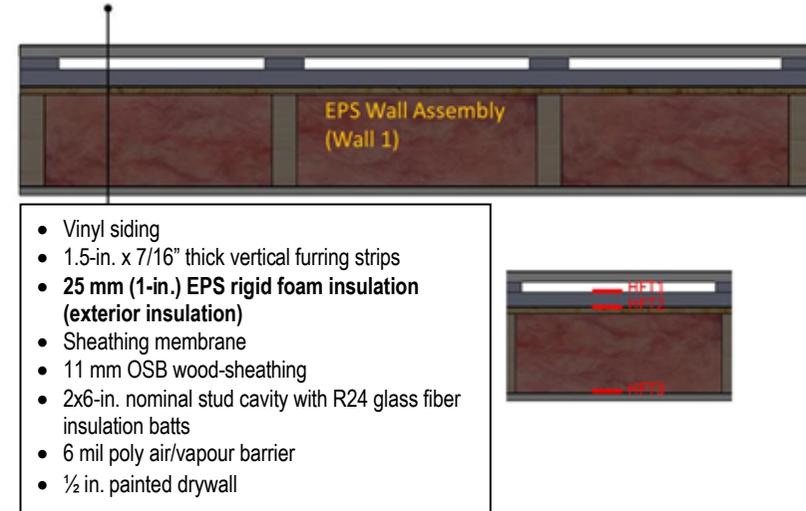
Wall 1 (W1: EPS) - Horizontal cross-section through EPS wall assembly showing locations of Heat Flux Transducers (HFT)
